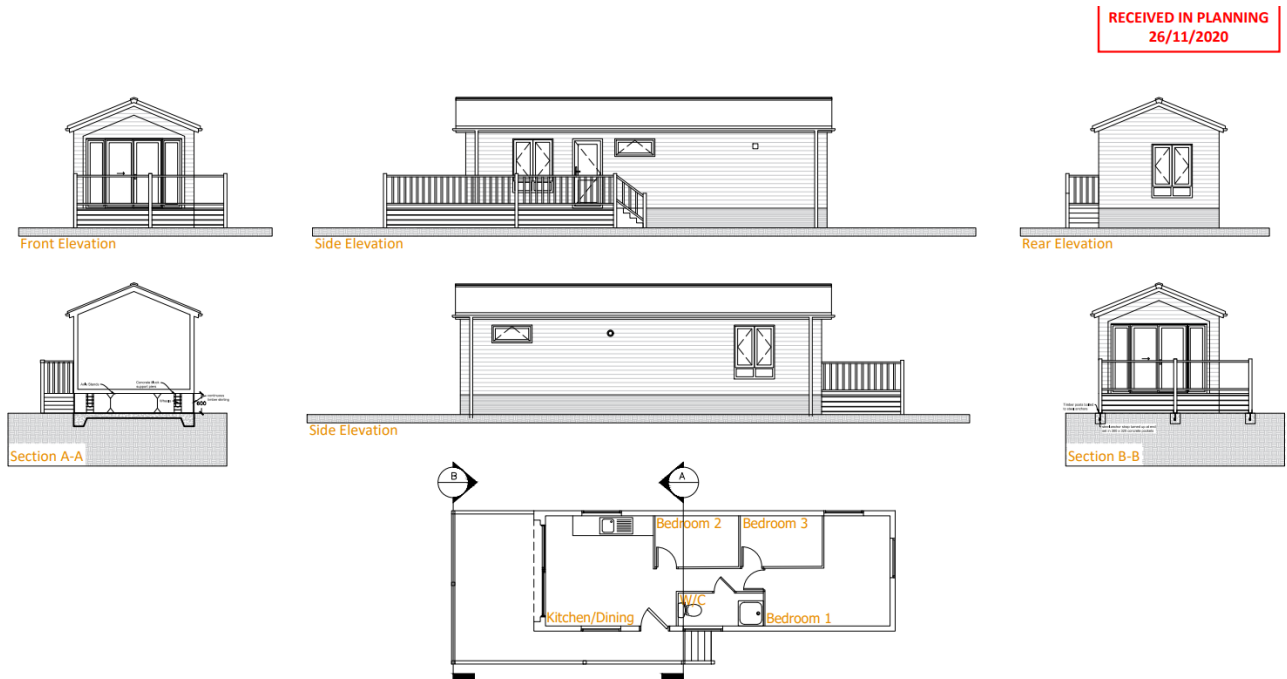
Proposed Elevations and Floor Plans of the Static Caravan:
